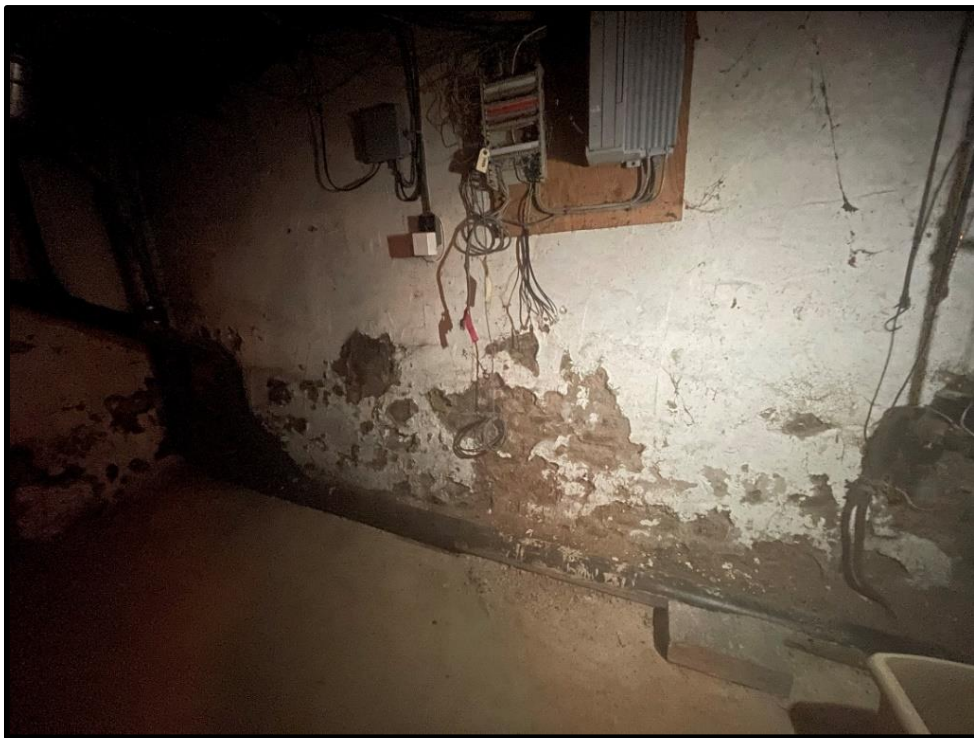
Basement Room with Concrete Parged Wall Showing Whitewash Stone Foundation
